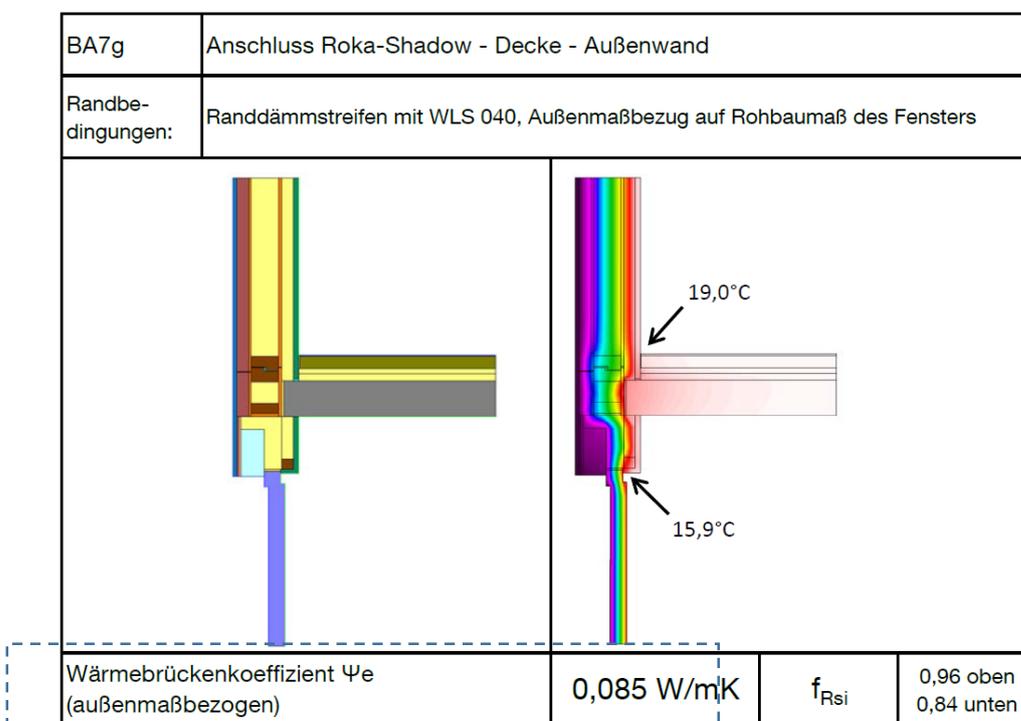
Connection of reinforced concrete slab with timber frame elements including a window
